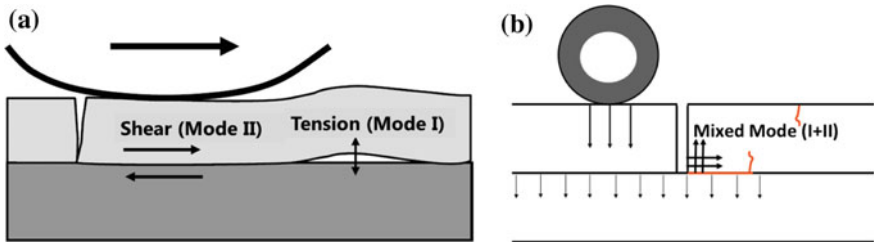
Pavement interface fracture debonding modes a far from a vertical crack [7] b at the edge of a vertical crack [36, 37]
